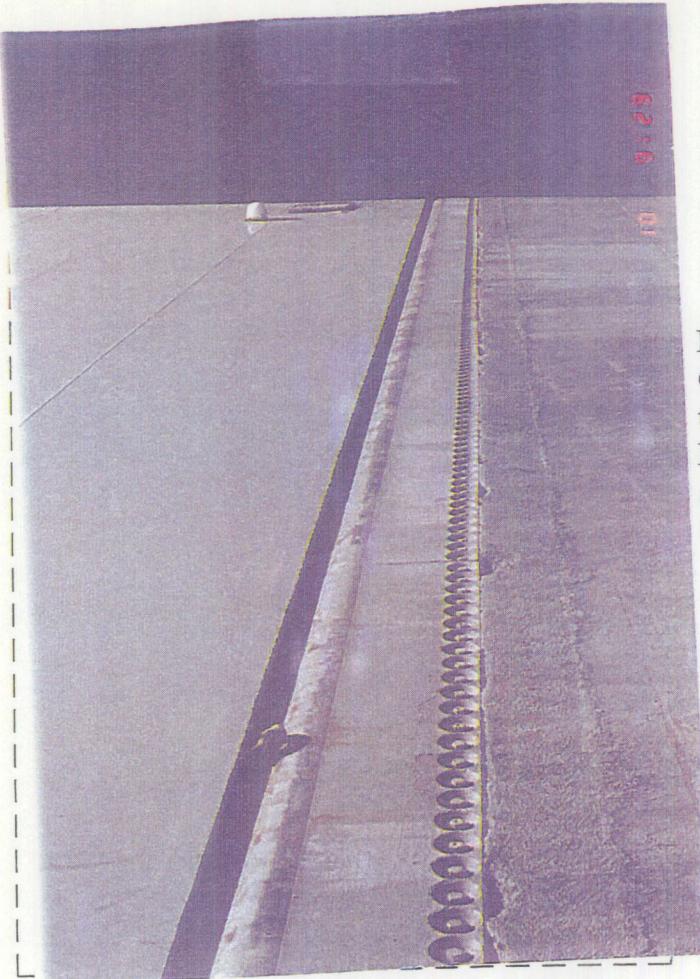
Morris Dam - 70' x 18' Drum Gates - Gate #1, View looking from right towards left of gate along gate hinge. Downstream skinplate seen to the left of hinge and spillway concrete seen to right of hinge. - Sept 10, 1998.
